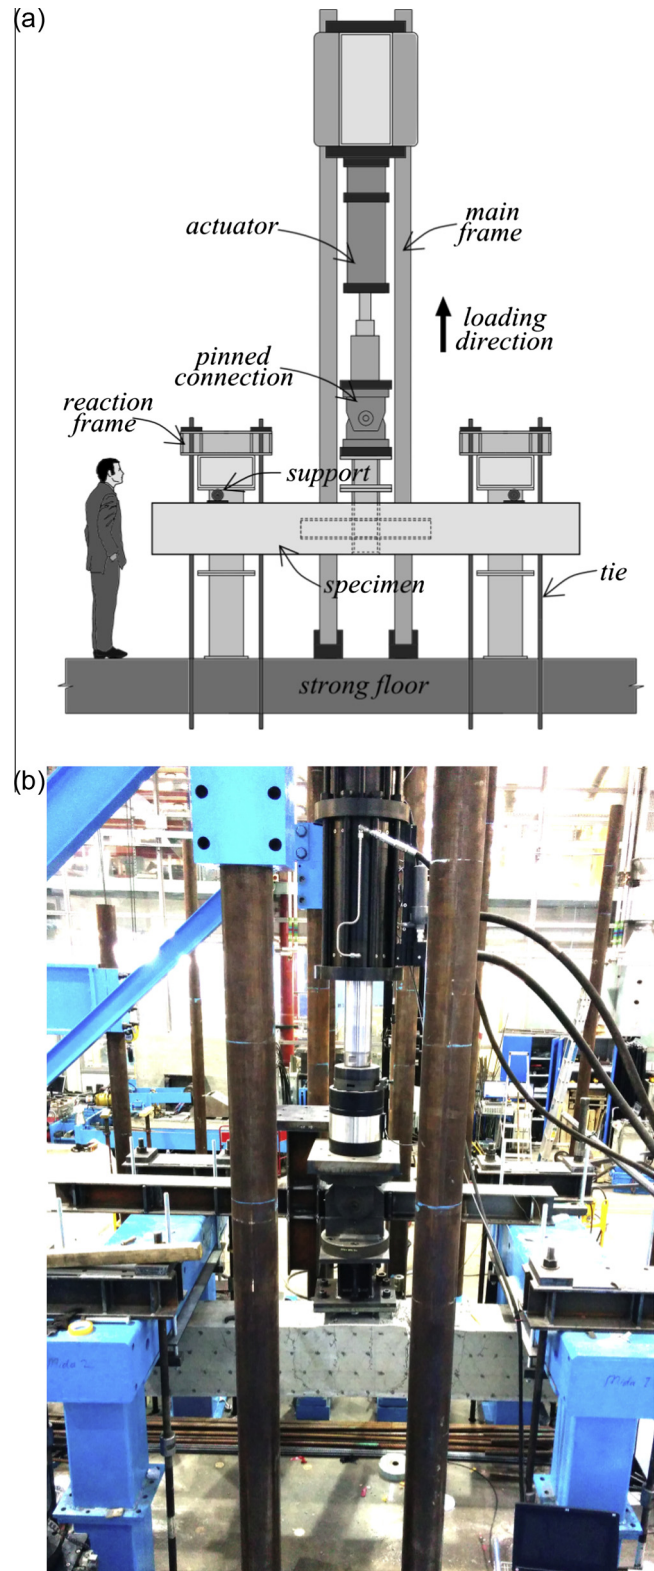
Testing arrangement: (a) test-rig layout, (b) general view of test set-up.
